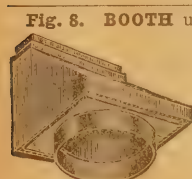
BOOTH used at bottom of stack to make connection with hot air pipe.
